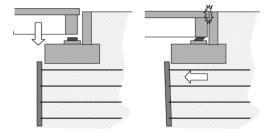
Example of a potential serviceability limit state at the top of a reinforced soil bridge abutment.
